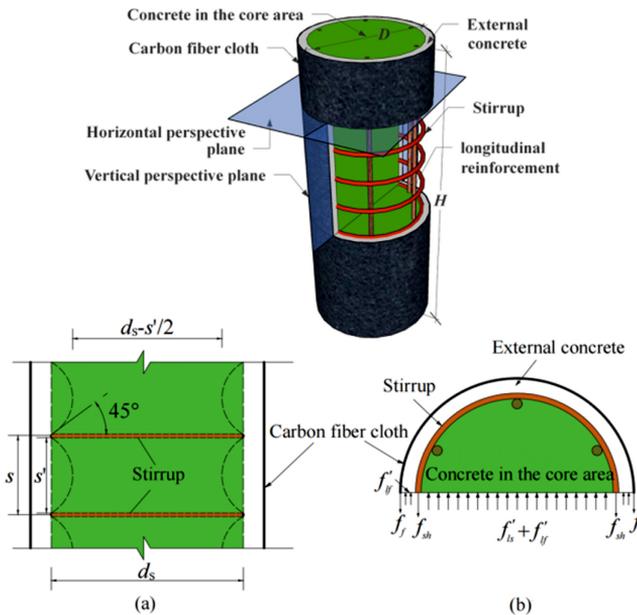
Sketch view of CFRP-strengthened RC cylinders: a) Longitudinal section, b) Transverse section
